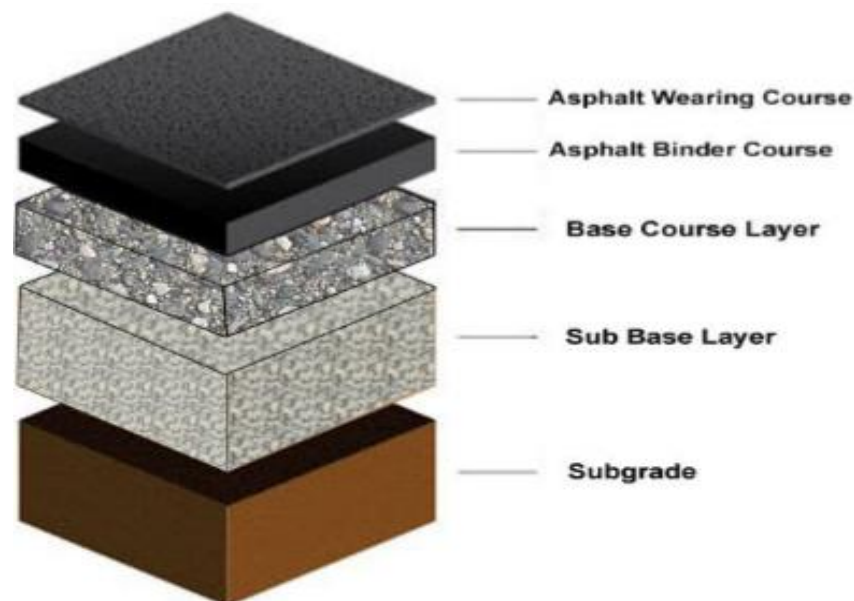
Flexible Pavement Layers (<https://theconstructor.org/transportation/flexible-pavement-composition-structure/5499/>)
